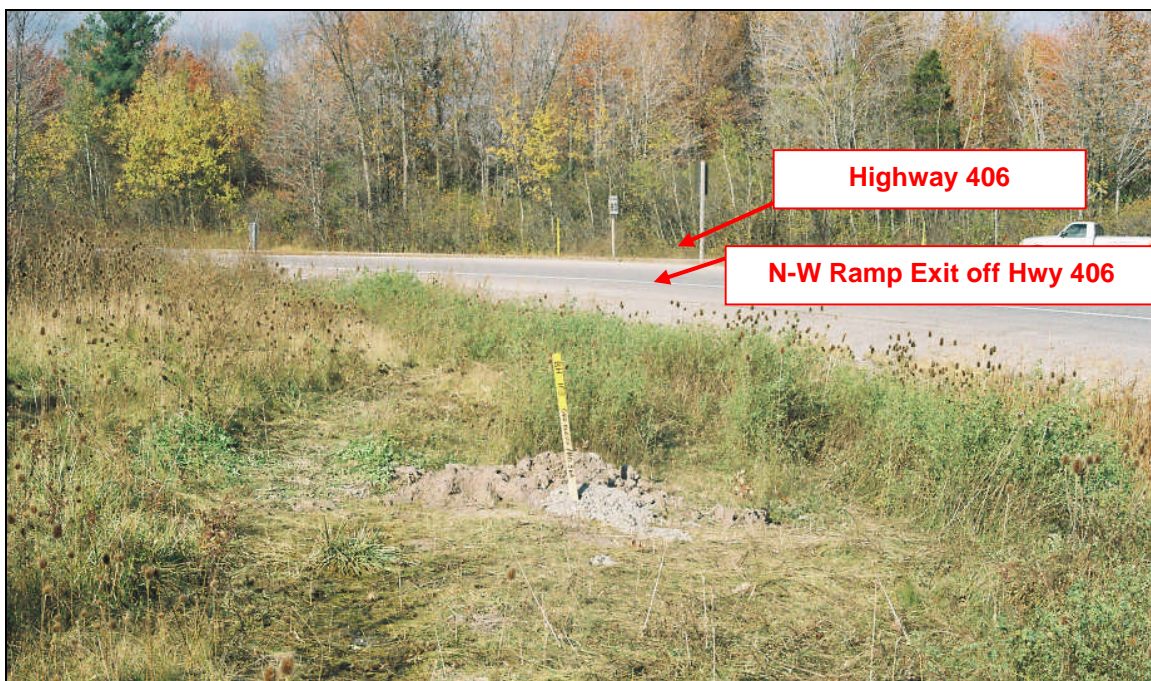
Looking to the northeast quadrant at the existing east fill embankment stockpile from the southwest corner of the Highway 406 and Merritt Road intersection. (October 31, 2008)
